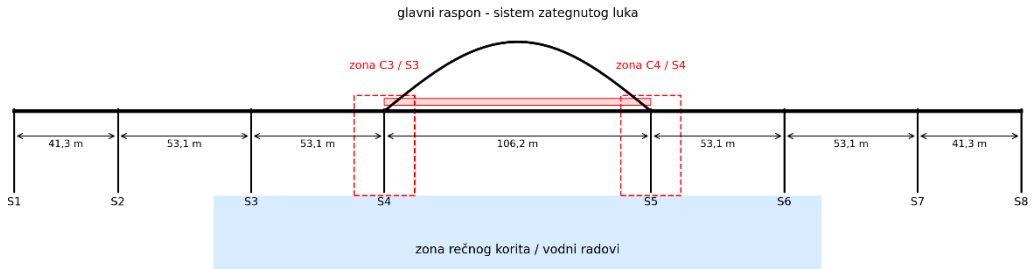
Layout of the Old Sava Bridge and water works zones relevant to the change in dismantling methodology
